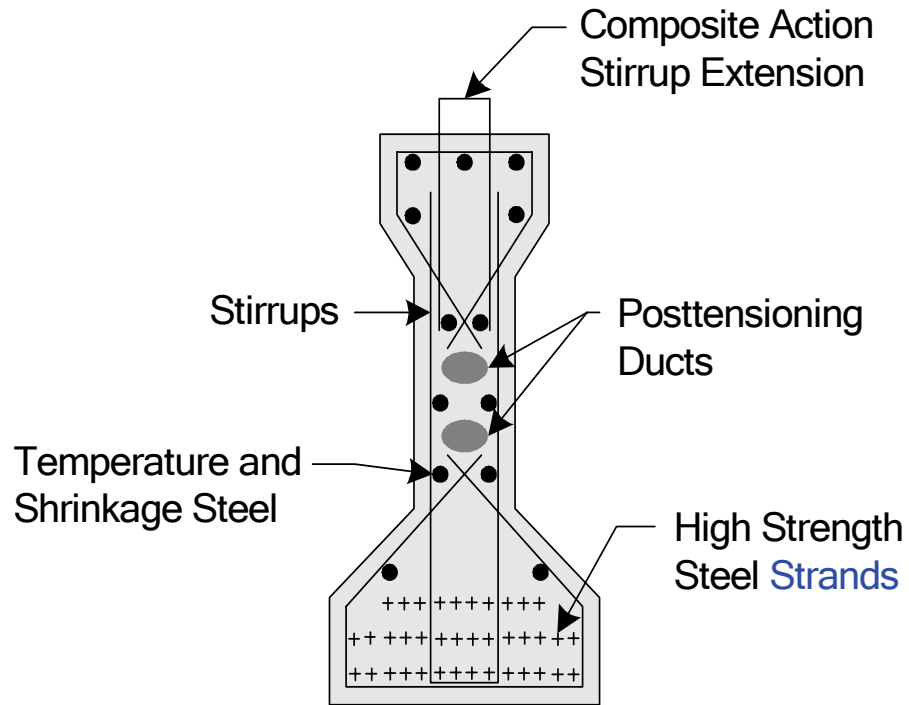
Prestressed I-beam Reinforcement (Schematic)
